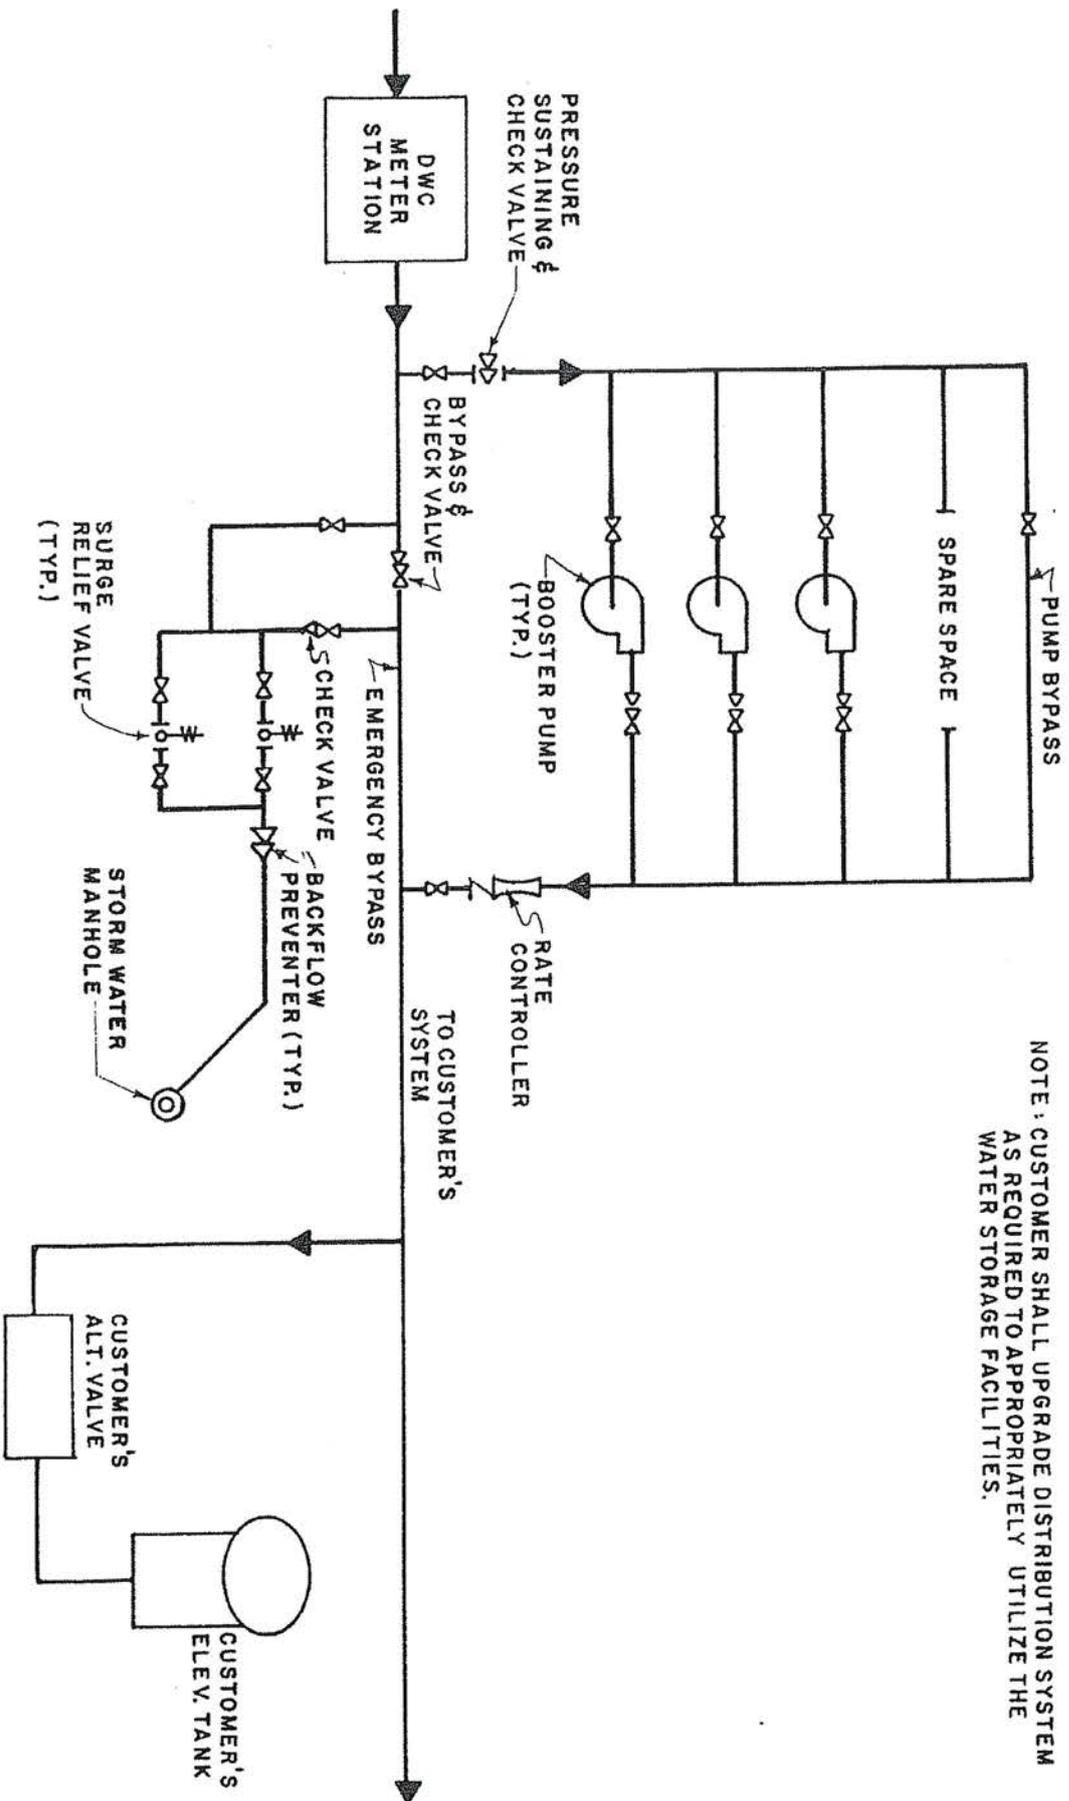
YORKVILLE UNIT SYSTEM CONNECTION FACILITIES
